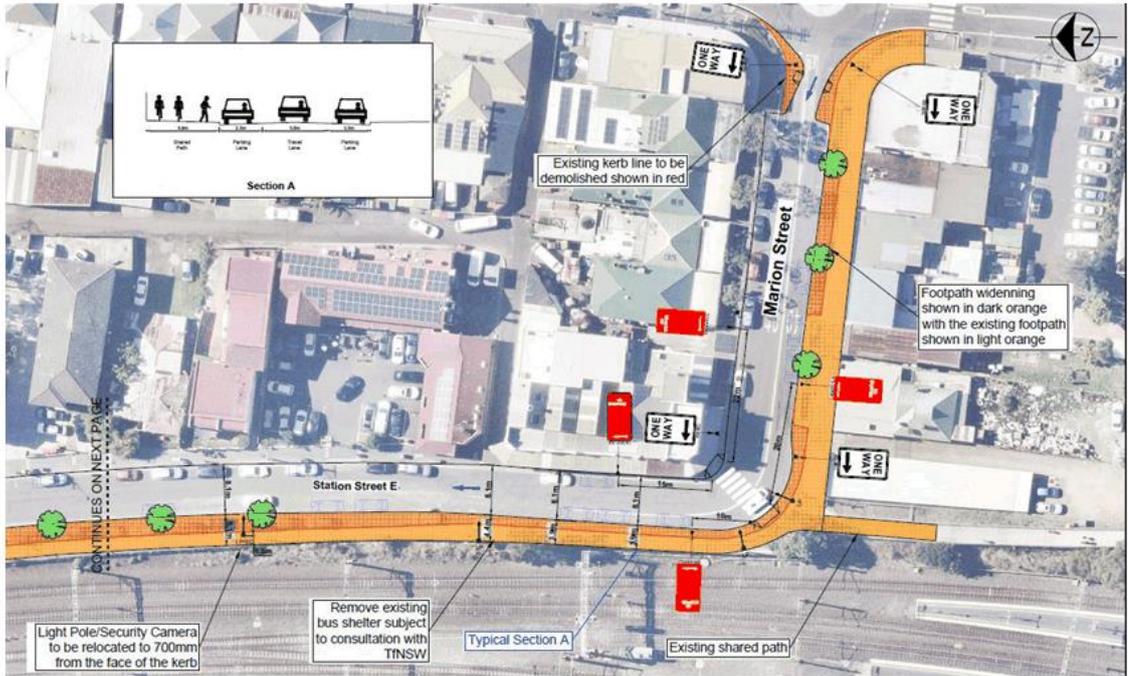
Concept plan of the footpath widening in Station Street East and Marion Street, Harris Park
